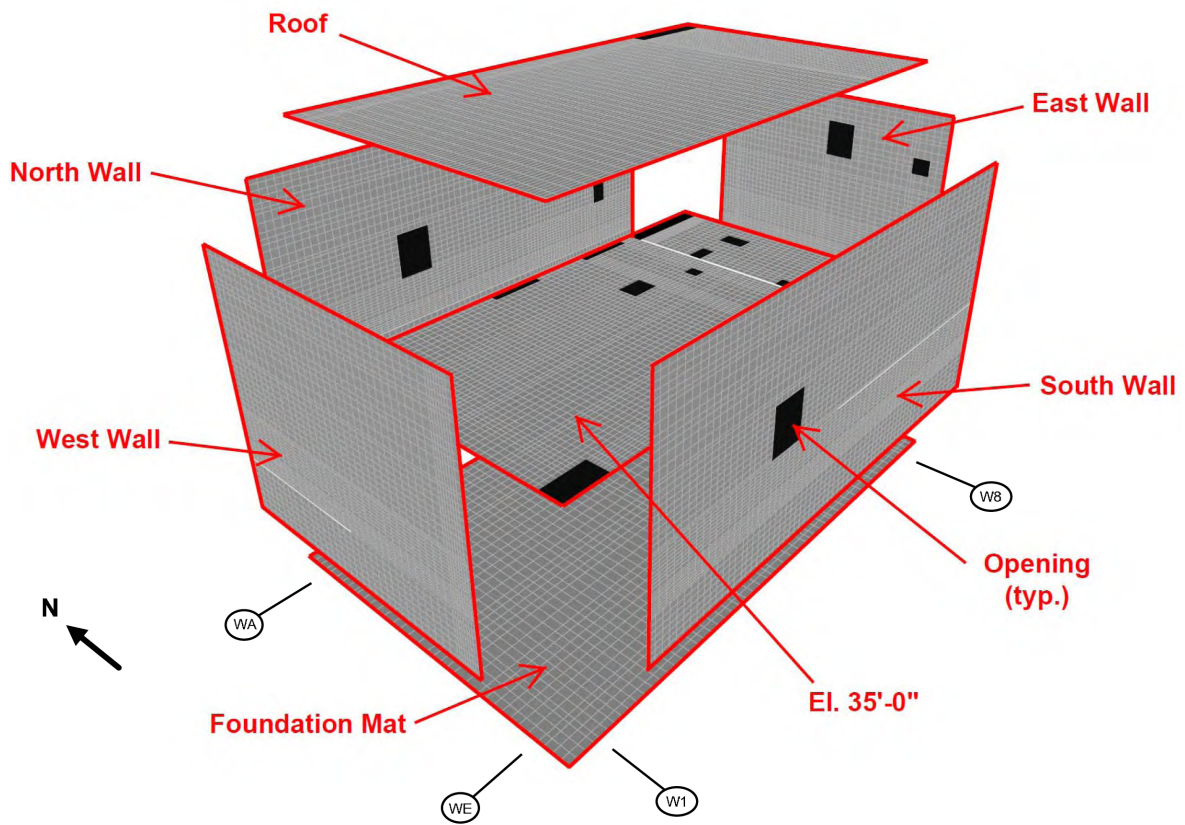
H.3-53 RWB Wall and Slab Labeling Convention
